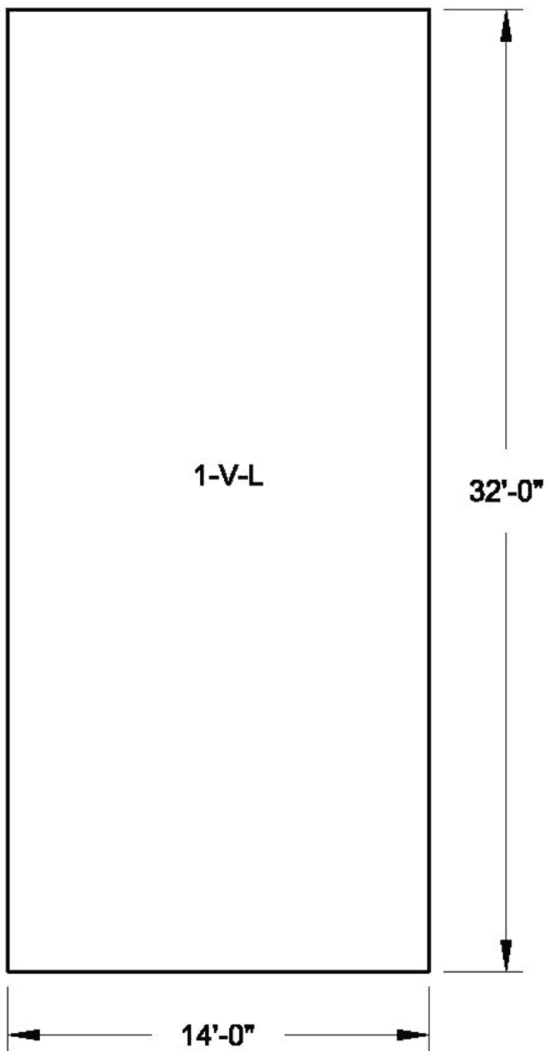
H.6-158 DGFOV Roof 5 Looking Down
